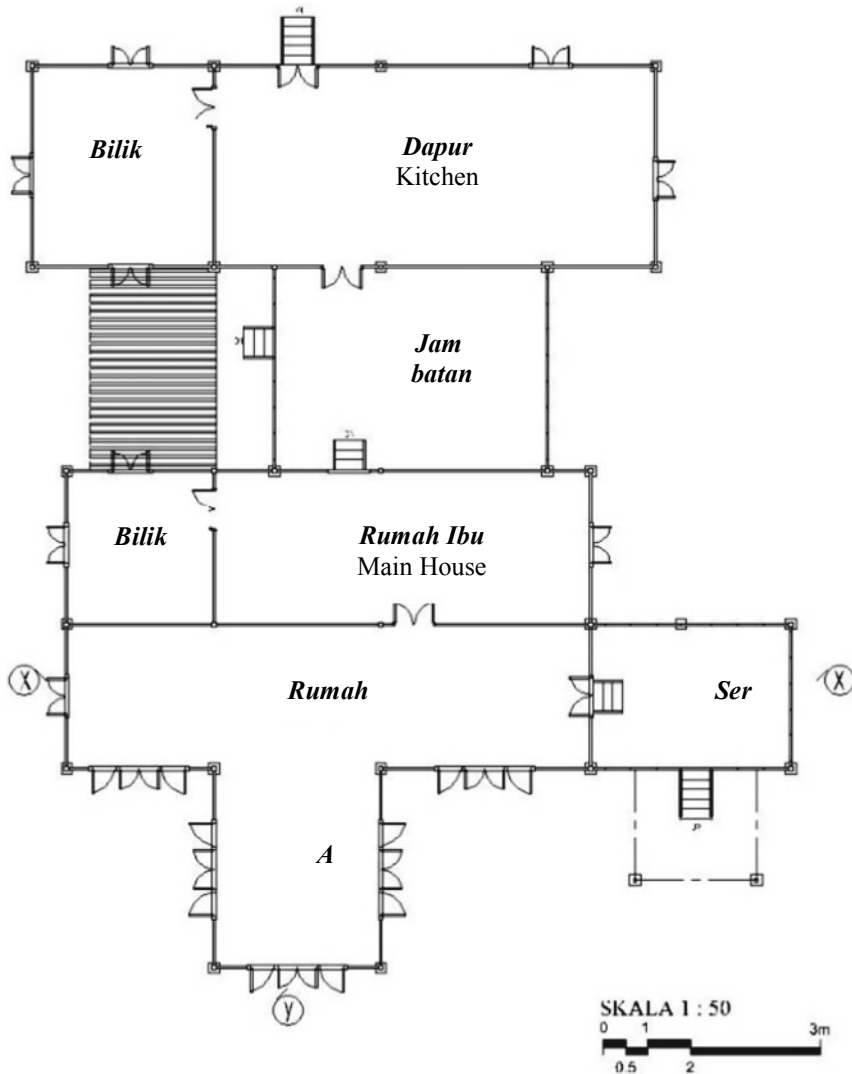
Floor plan of Daeng Haddadek house. *Source* Centre for the study of built environment in the Malay world (KALAM)
